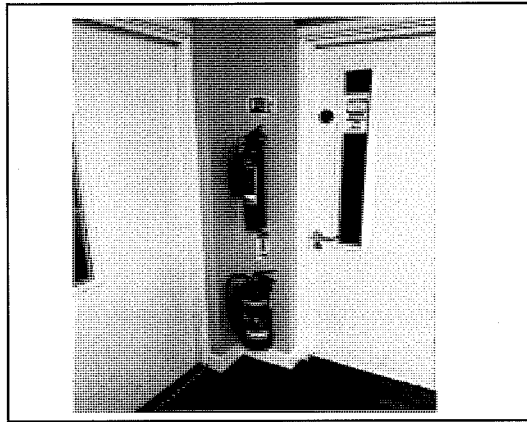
; Shows extinguishers within the rear meeting room wall mounted too high.
